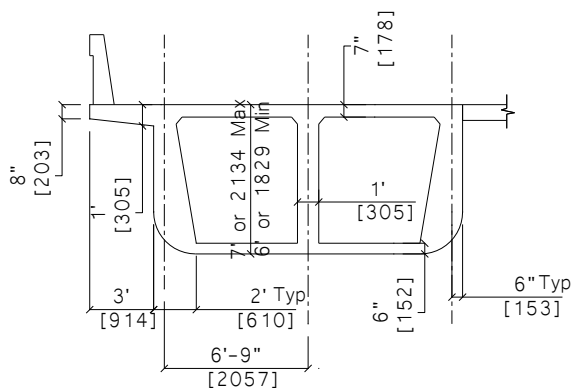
Superstructure cross-sectional details of Frame 1 and 3, Bridge 5EB
